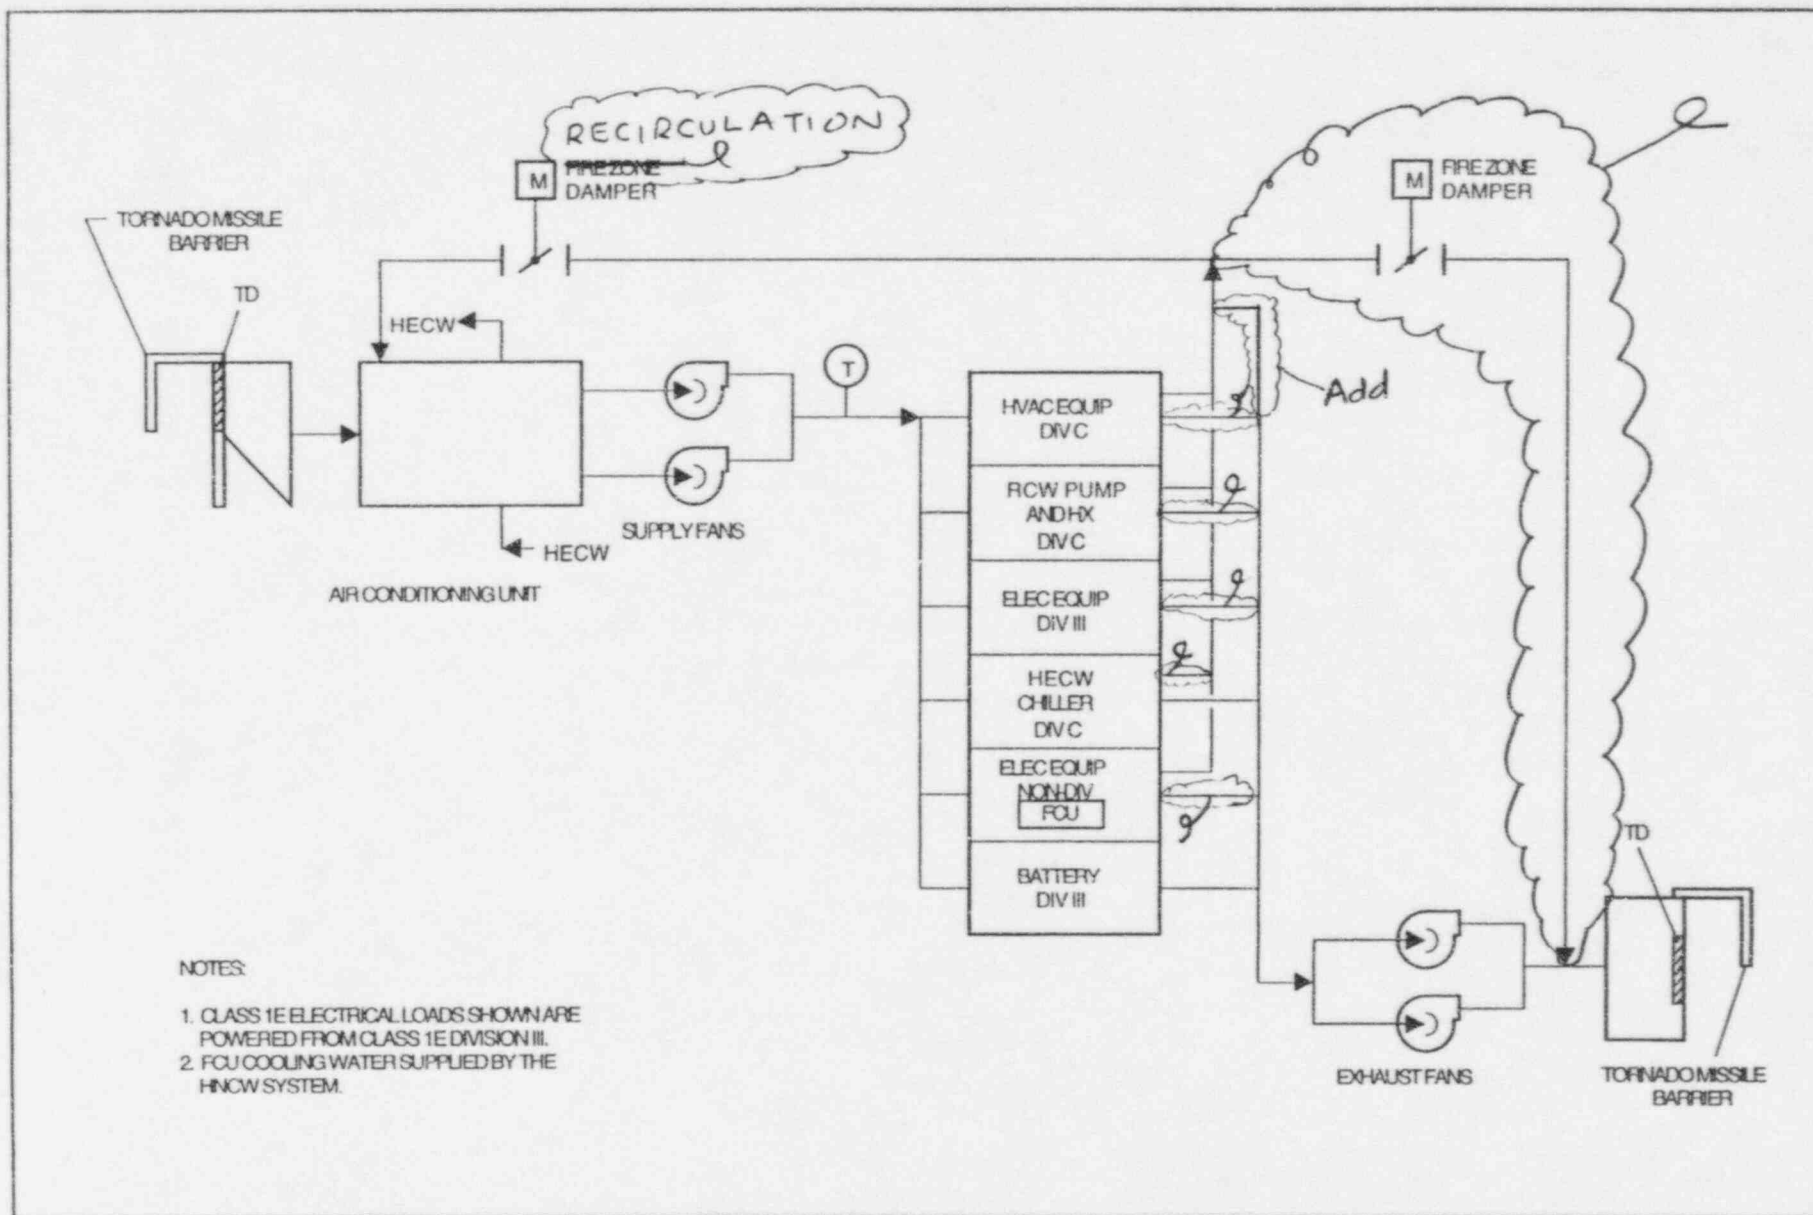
Control Building Safety-Related Equipment Area HVAC System (Division C)
